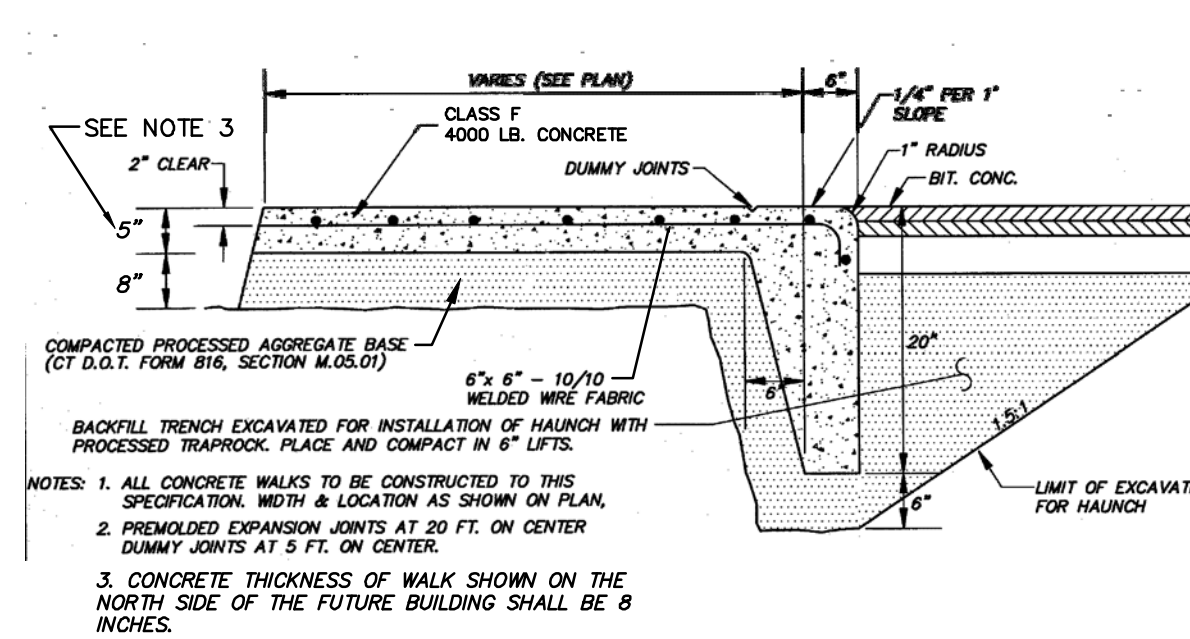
DETAILS OF CONCRETE WALK WITH INTEGRAL CONCRETE CURB
